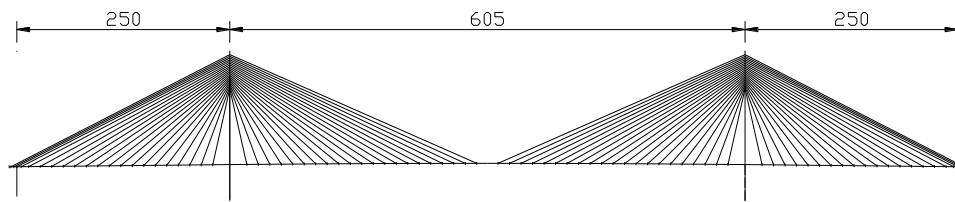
General layout of the Qingzhouminjiang Bridge (Units: m)
